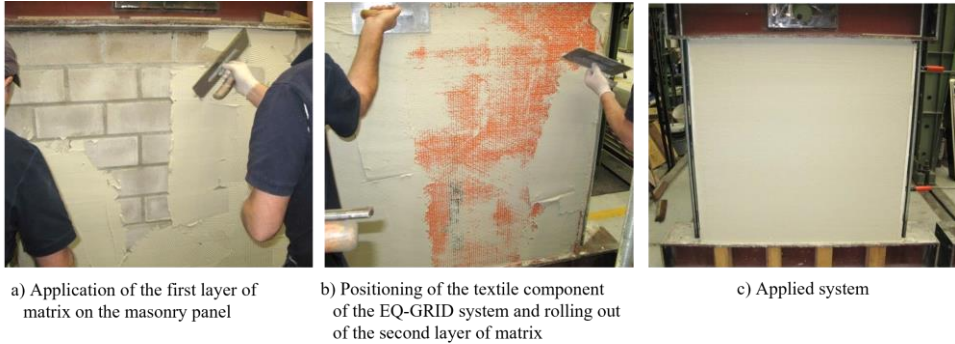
Application of the EQ-GRID system on a masonry wall
